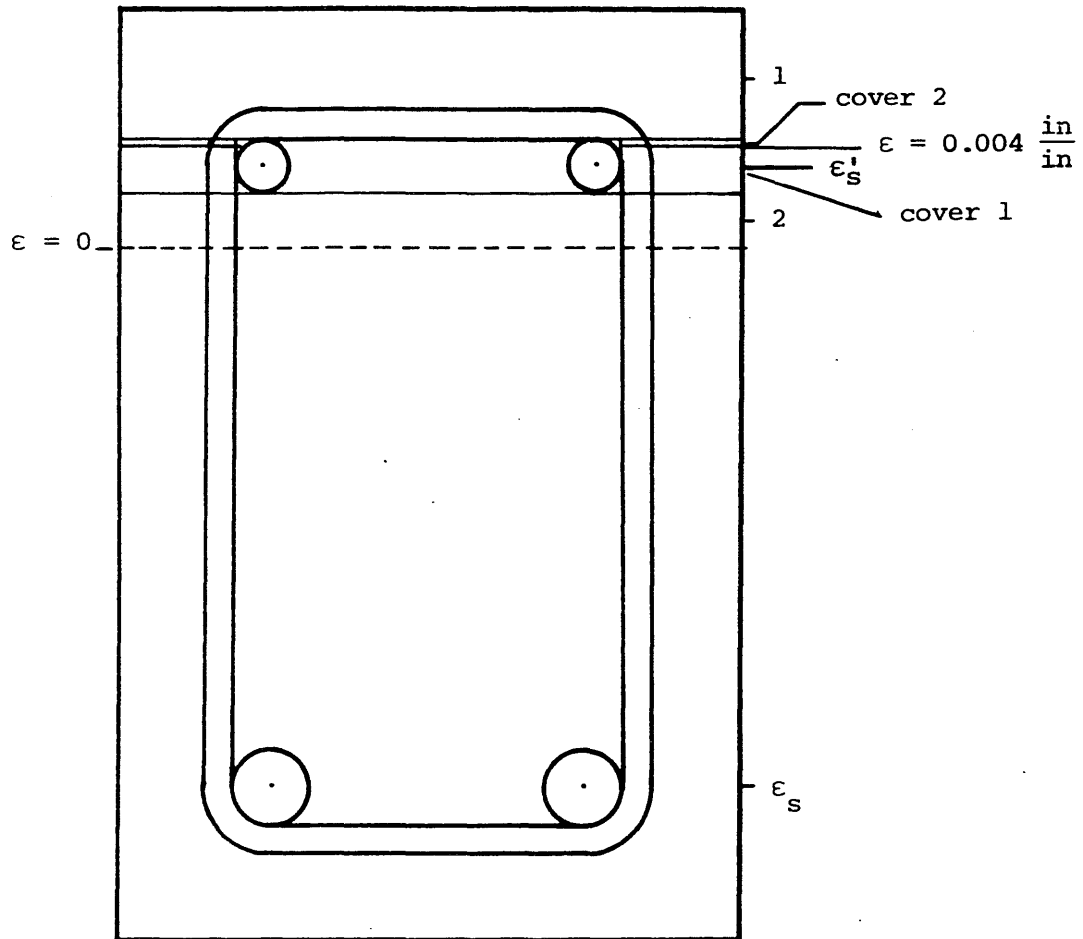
Beam J-2 cross section for Case 5.
